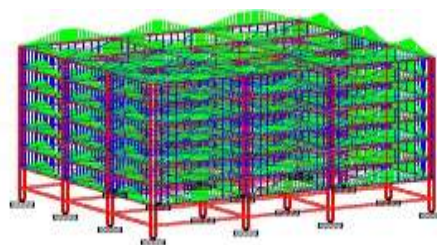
Rendering view for G+6 building Fig 4. Dead load assignment in G+6 building model.
